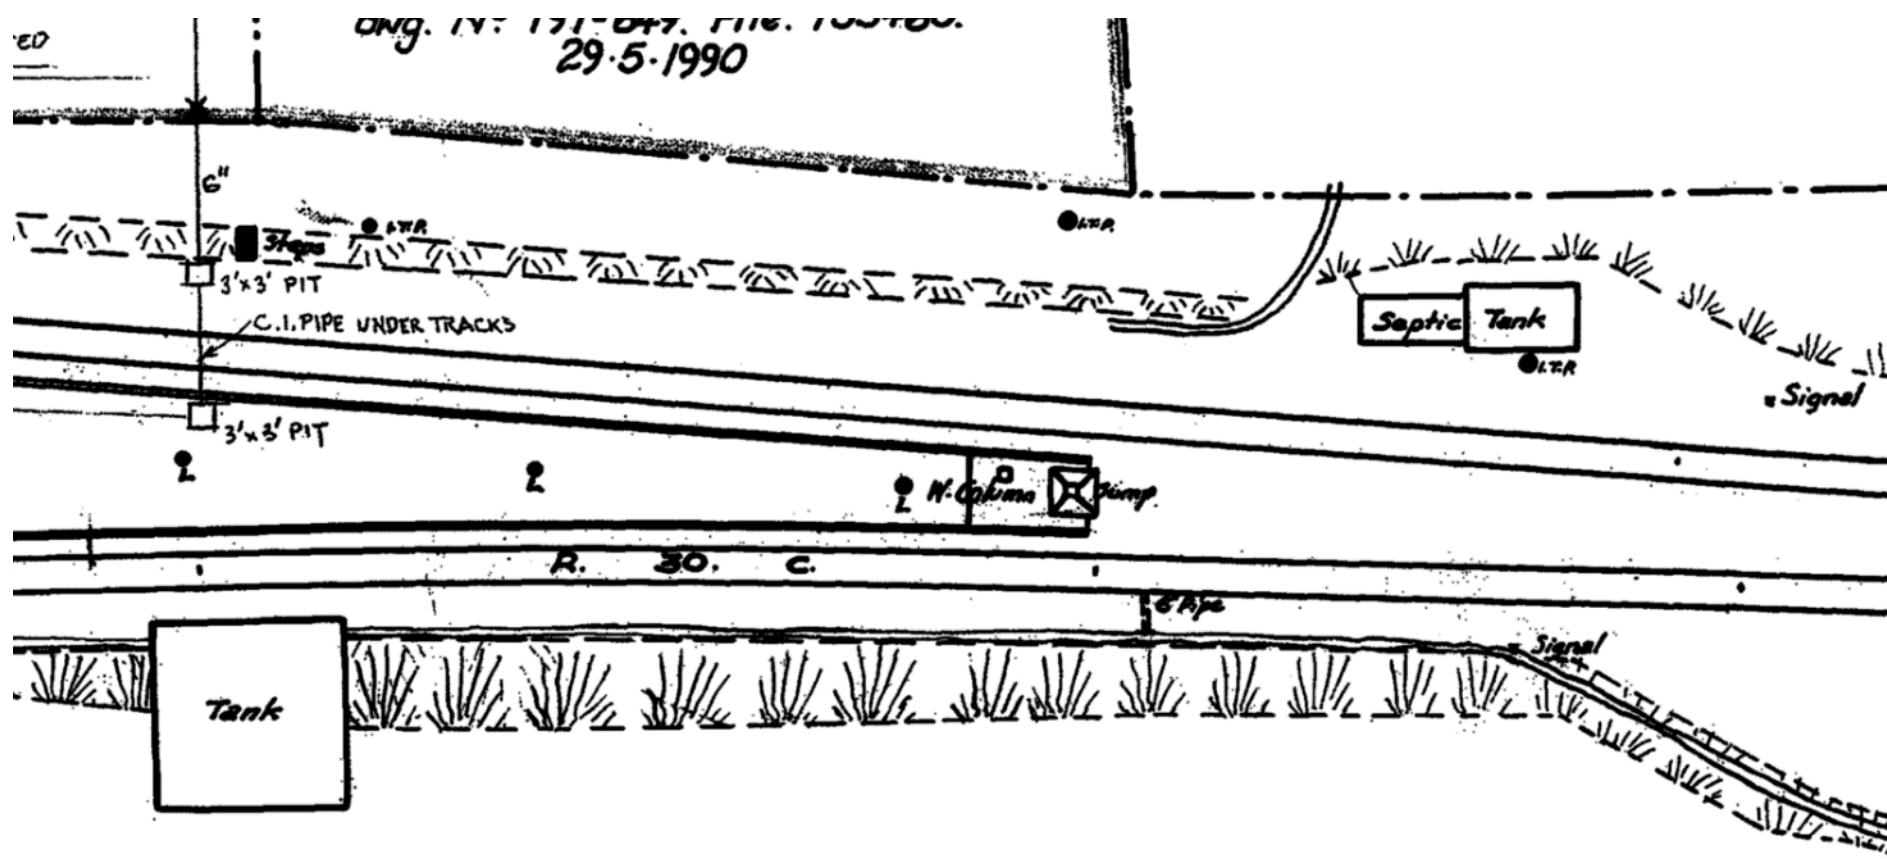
Detail of 1931 plan of Blackheath Station Arrangement showing Blackheath Station Source: Sydney Trains Plan Room, CV0070491.
